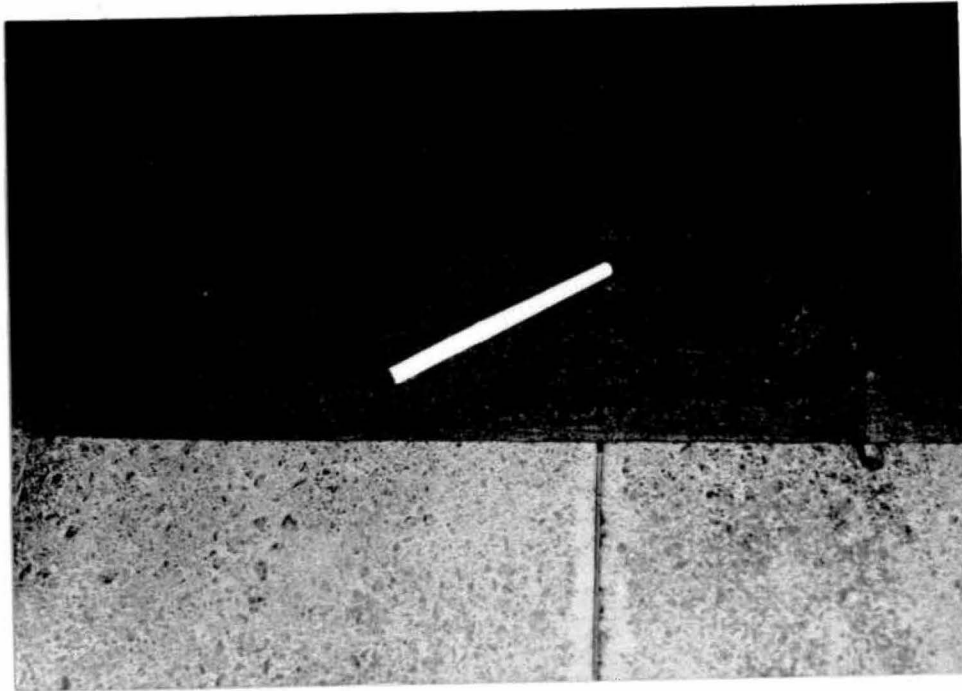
Low modulus fabric placed over cracked pavement.
